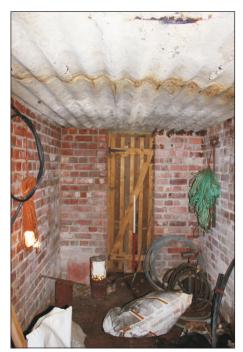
The east room of the shelter, looking north-northeast. (1m scale)
